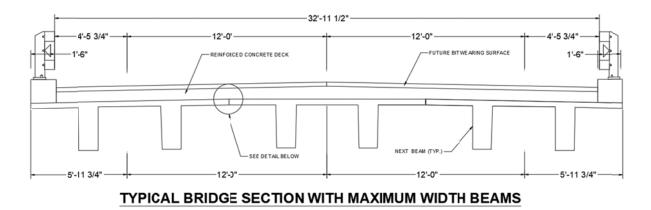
Beam Flange Serving As a Form for a CIP Deck (Redrawn from High Bridge Team 2016).
